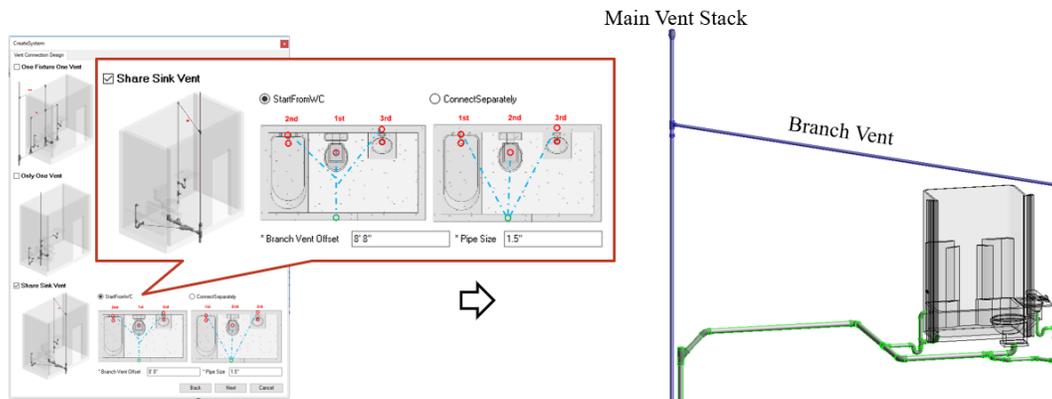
Vent pipe design example for a bathroom on the second floor
